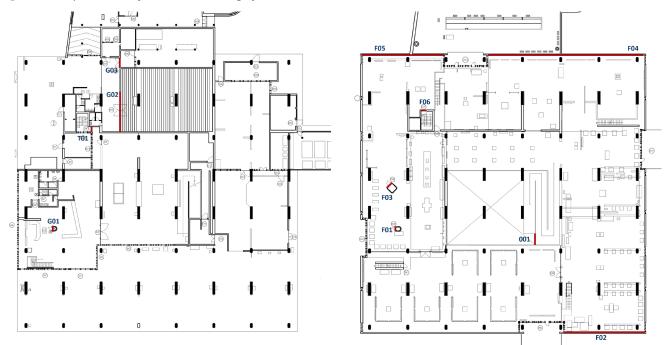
Sample location for material testing of Paint - Ground Floor (L); First Floor (R)
